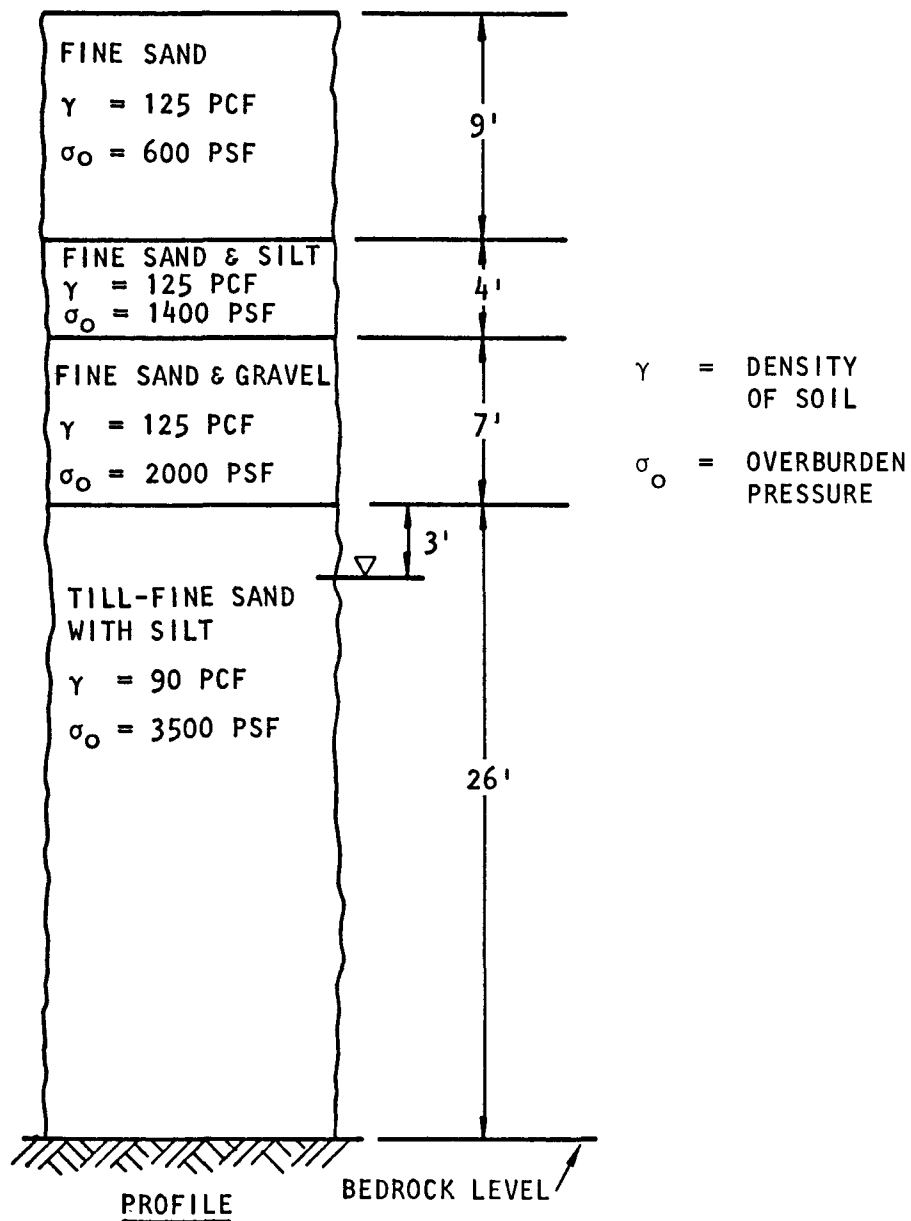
SITE PROFILE ASSUMED FOR EXAMPLE PROBLEM
